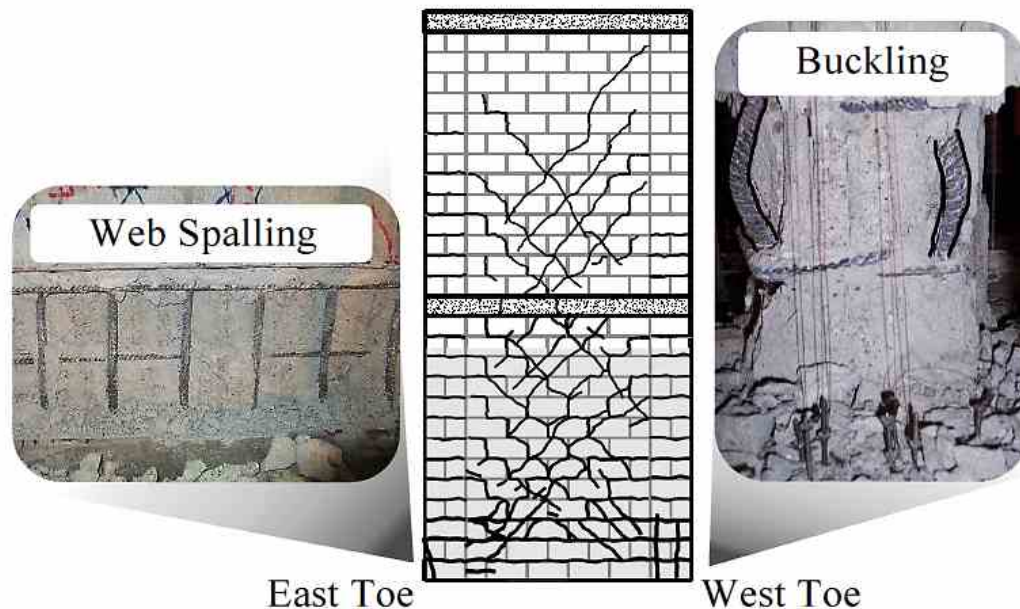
Crack Pattern and Failure Mechanisms of Wall 3
